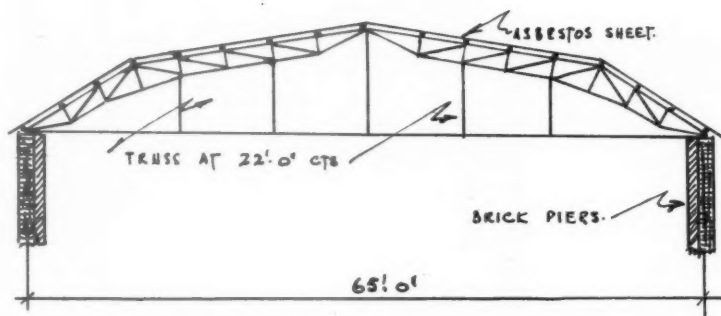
Composite tubular roof truss used in conjunction with brick construction.
